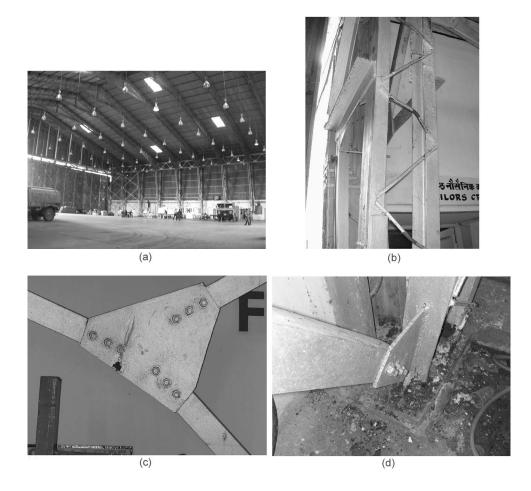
INS hangar at Port Blair Airport: (a) truss configuration, (b) buckling of braces in steel columns (photos: H. Kaushik), (c) buckling of gusset plates connecting nonconcurrent braces between adjacent columns, and (d) severe corrosion at the junction of the base plate and column at the ground level (photos: S. Jain).
